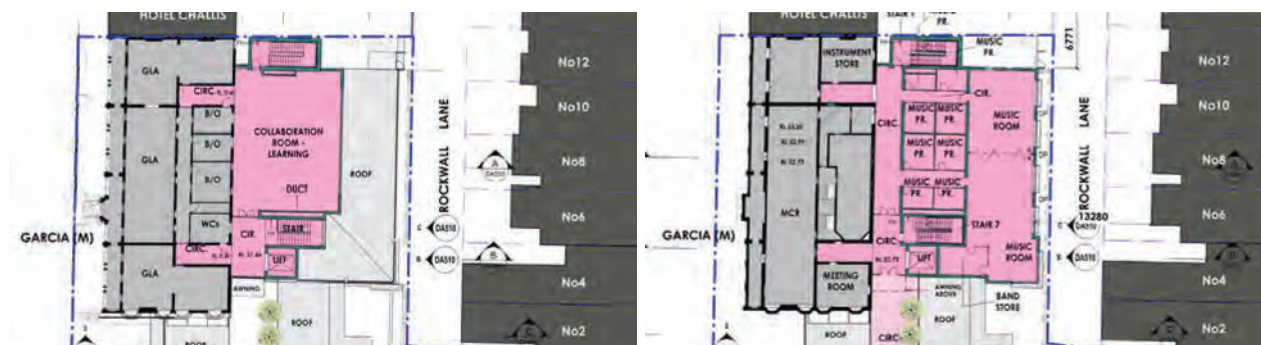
Proposed Floor Plan Level 5 (left) and Level 4 (right)
